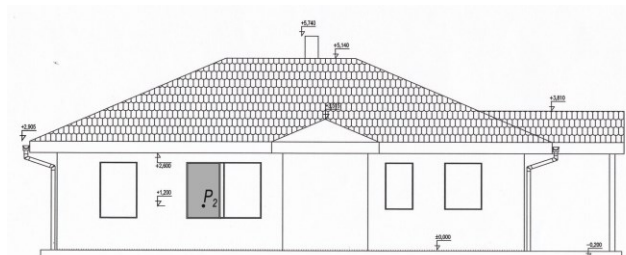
View on the façade with 0.9 m x 1.5 m window in the playroom 107
